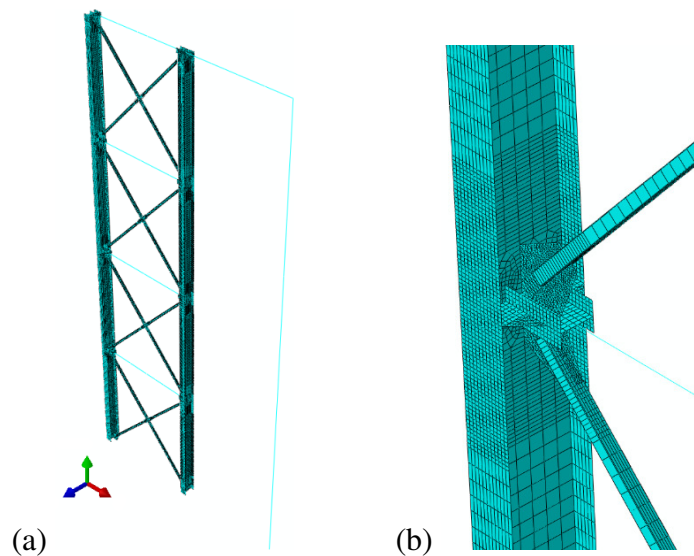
MTCBF finite element model: (a) full frame; (b) strut-column-brace connection.
